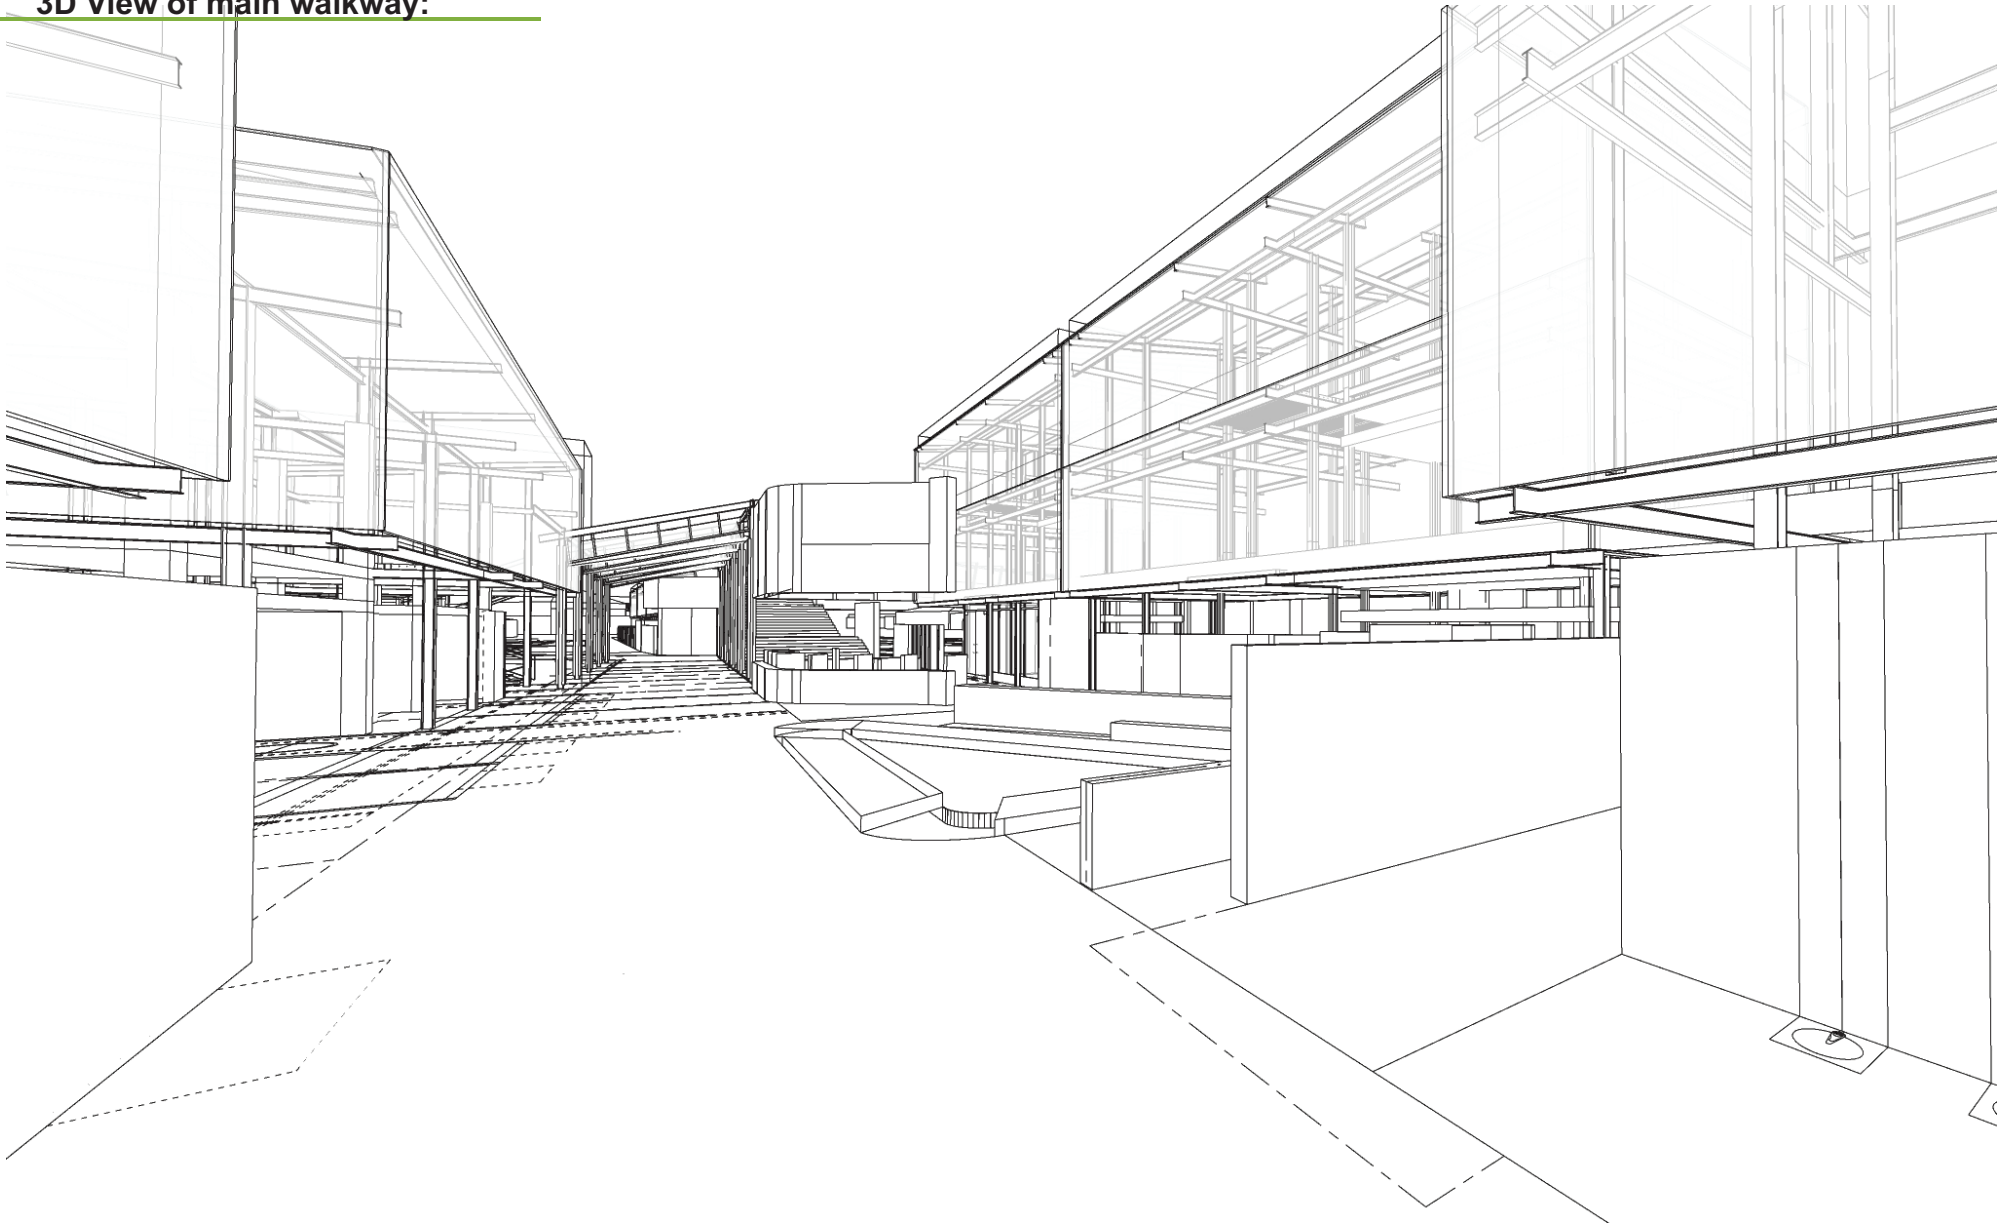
Image showing 3D view of main public walkway space (Nemasetoni 2021)
